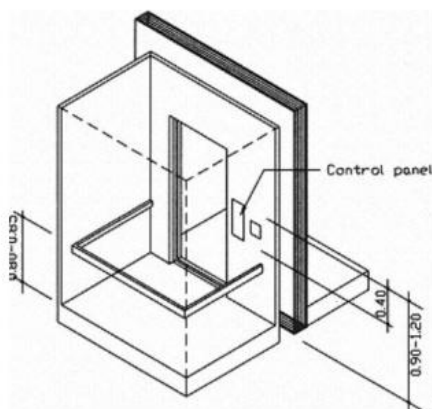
showing the handrail on three sides fixed within the elevator, 0.80-0.85 from the floor
